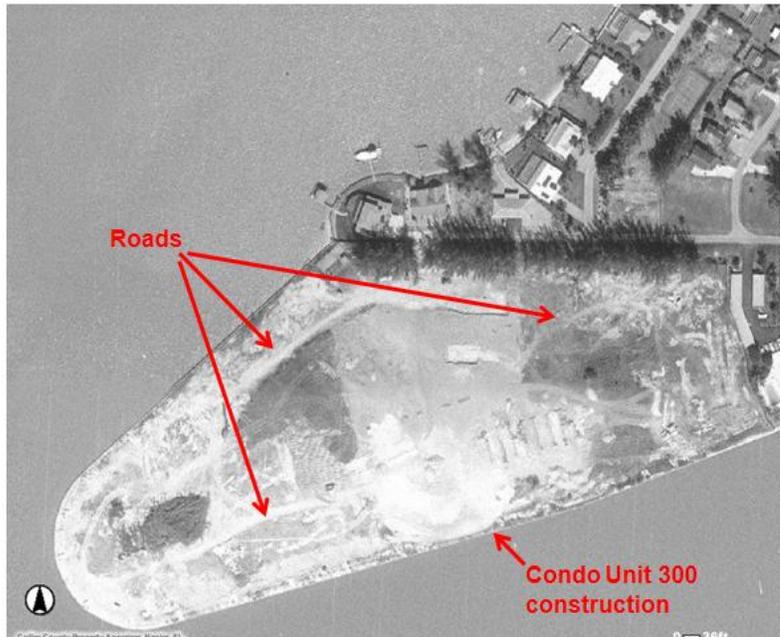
A: Source: Collier County Appraiser. Overhead photo of La Peninsula showing roads and condo construction in February 1985, consistent with record drawings and other data.
